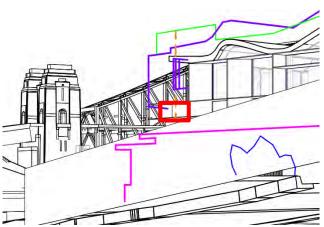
Proposed view from Unit 17/ 21 Waiwera Street
